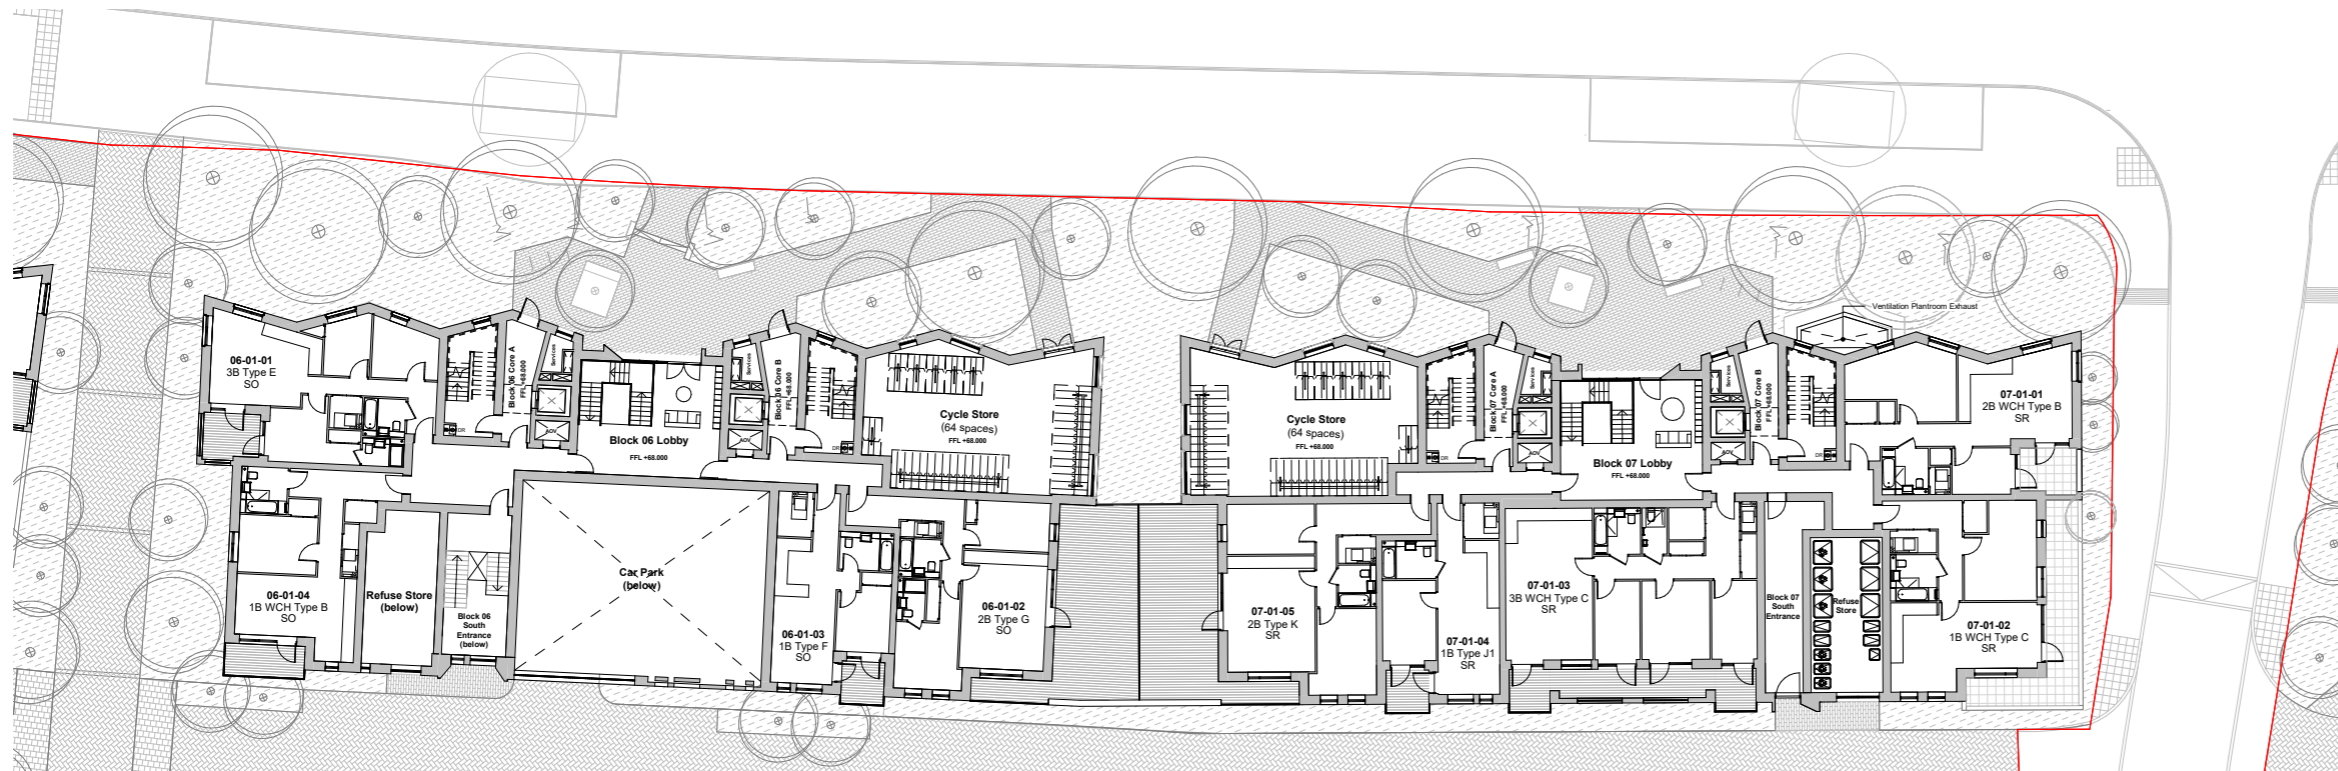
Block 6 & 7 Ground Floor Plan as approved
